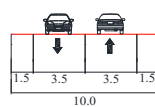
Typical cross section of City center Road (Tertiary: Urban / Rural Area)
